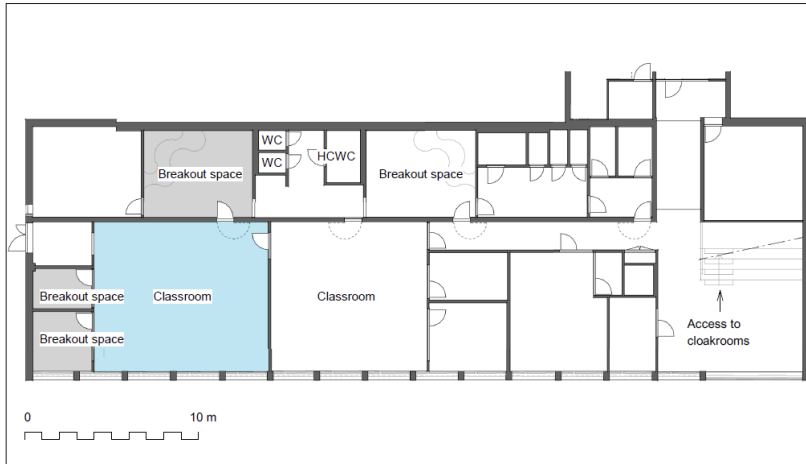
Excerpt of a simplified floor plan for the Bergen school. The classroom studied is marked in blue, and relevant breakout spaces in grey. Source: The author.
